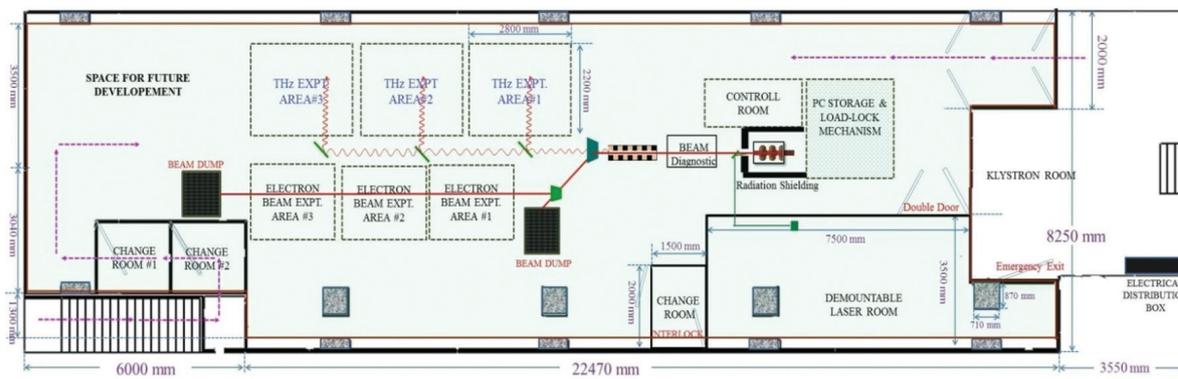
IUAC FEL facility: beam hall tentative layout
